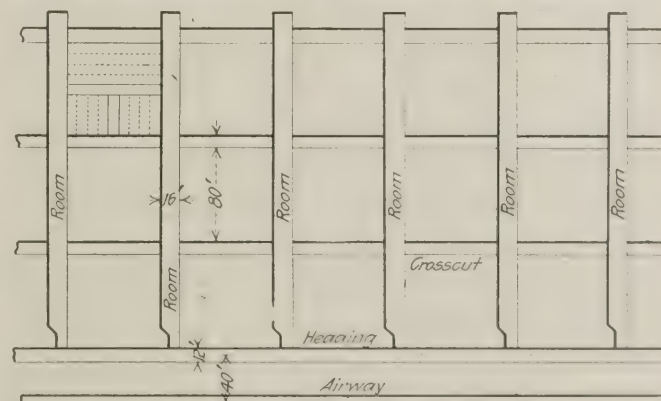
RELATION OF PILLARS AND ROOMS AND A METHOD OF ROBBING ROOMS
